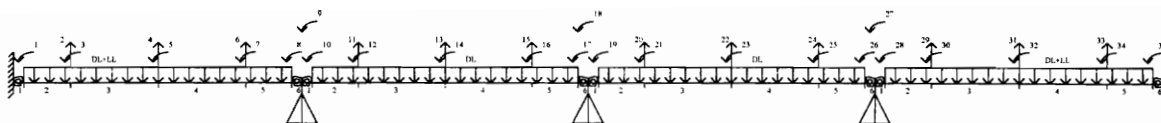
Four Beam Span Model With Semi-Rigid Connections
